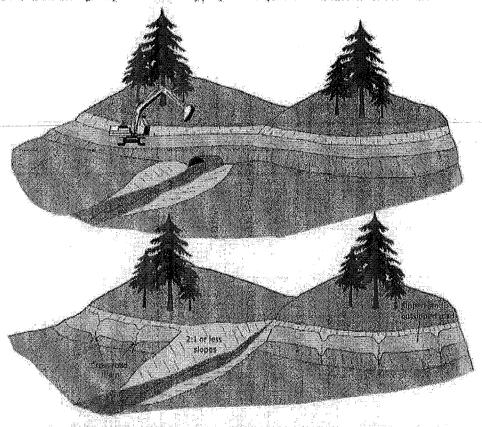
On roads that are to be closed (decommissioned), all stream crossing culverts and fills should be removed. Stream crossing excavations are best performed using an excavator. The original channel should be excavated and exhumed down to the former streambed, with a channel width equal or greater than the natural channel above and below the crossing. Sideslopes should be laid back to a stable angle, typically a 2:1 (50%) gradient, or less. Spoil can be endbauled off-site or stored on the road bench adjacent the crossing, provided it is placed and stabilized where it will not erode or fall and enter the stream.
